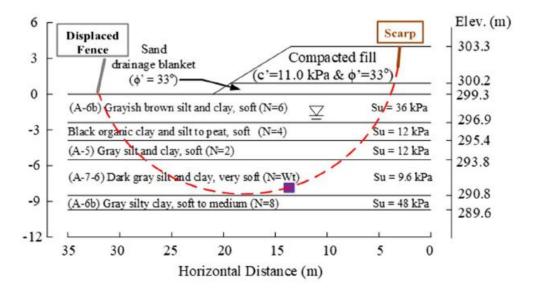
Sub soil profile for the failed embankment at the site and representing estimated undrained shear strength of the layered soils (Ghada 2020)
